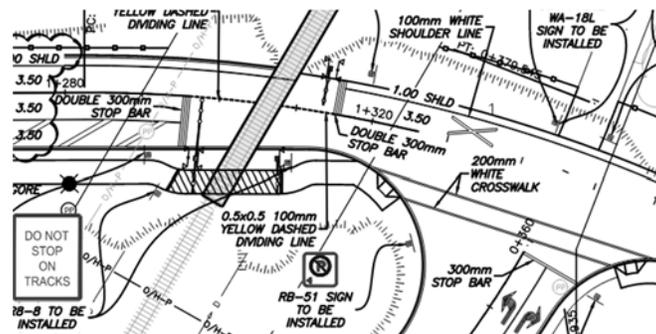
Womacks Rd & Gregg St Design Pavement Markings
